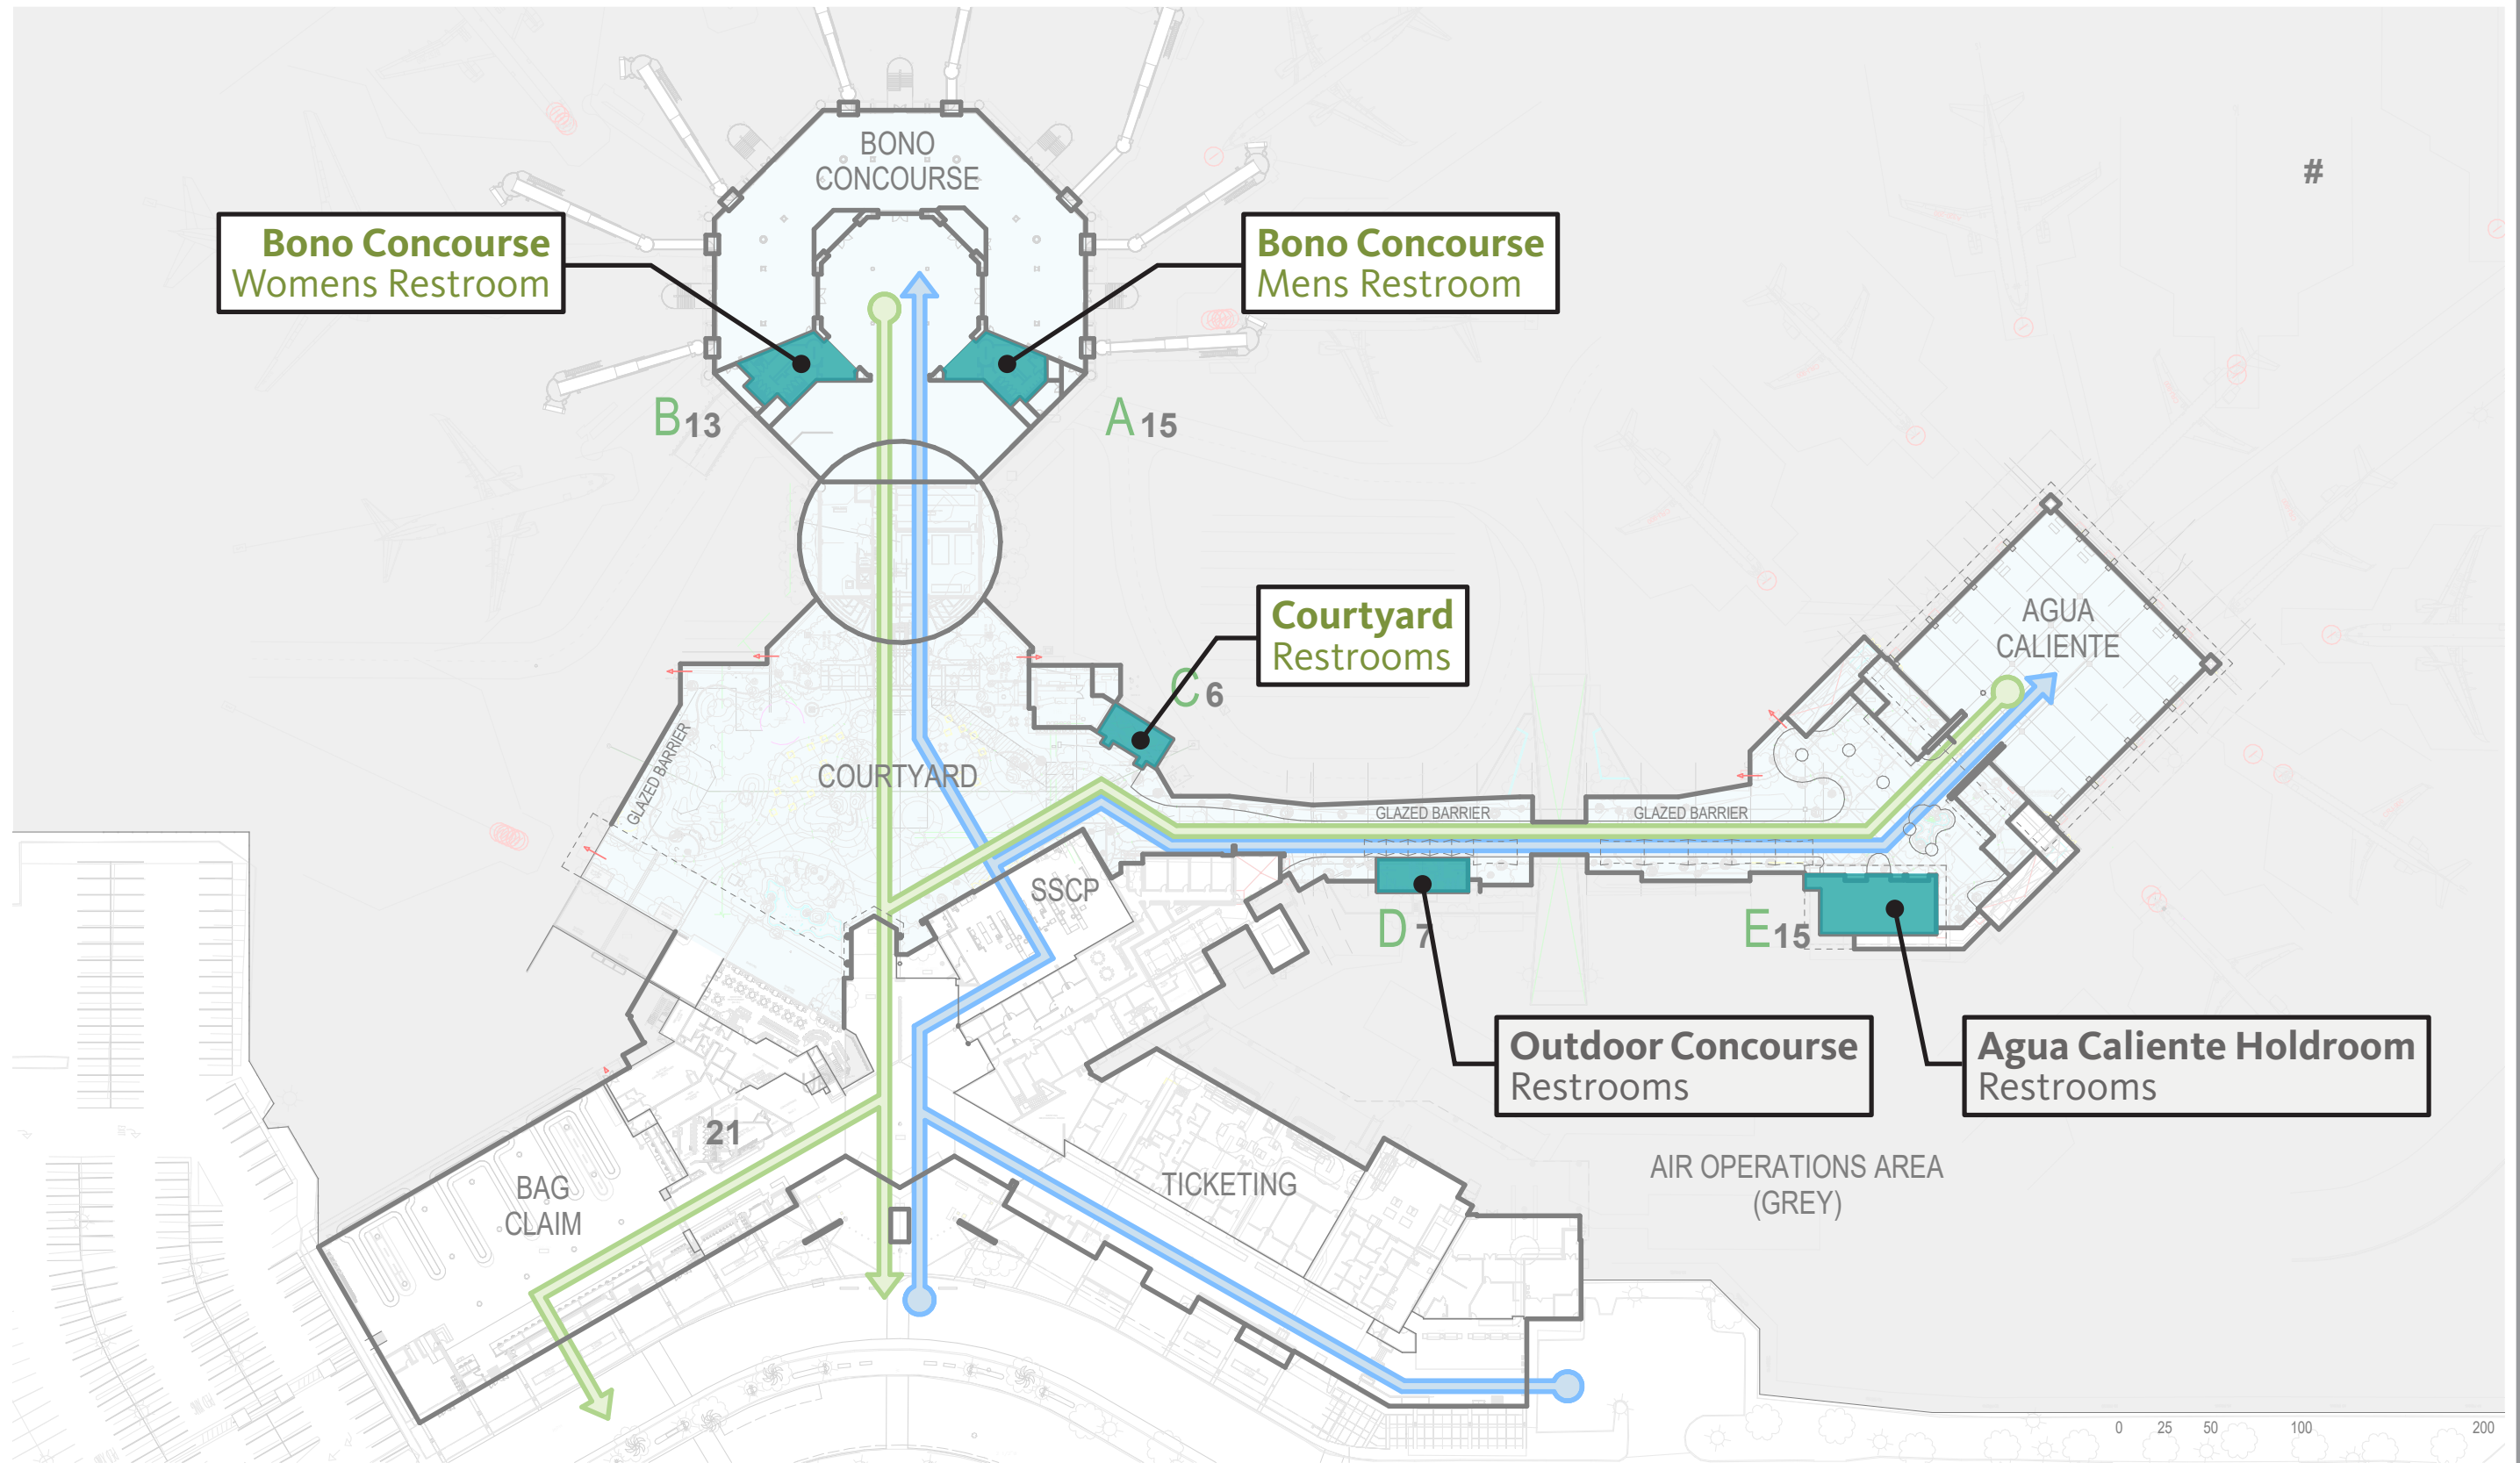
A - PSP Site Plan, Airside restrooms in scope.
